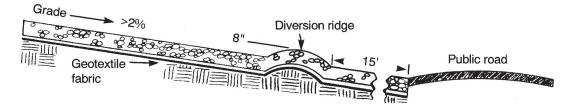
Cross-section of a Construction Entrance/Exit (NC, 1993)
